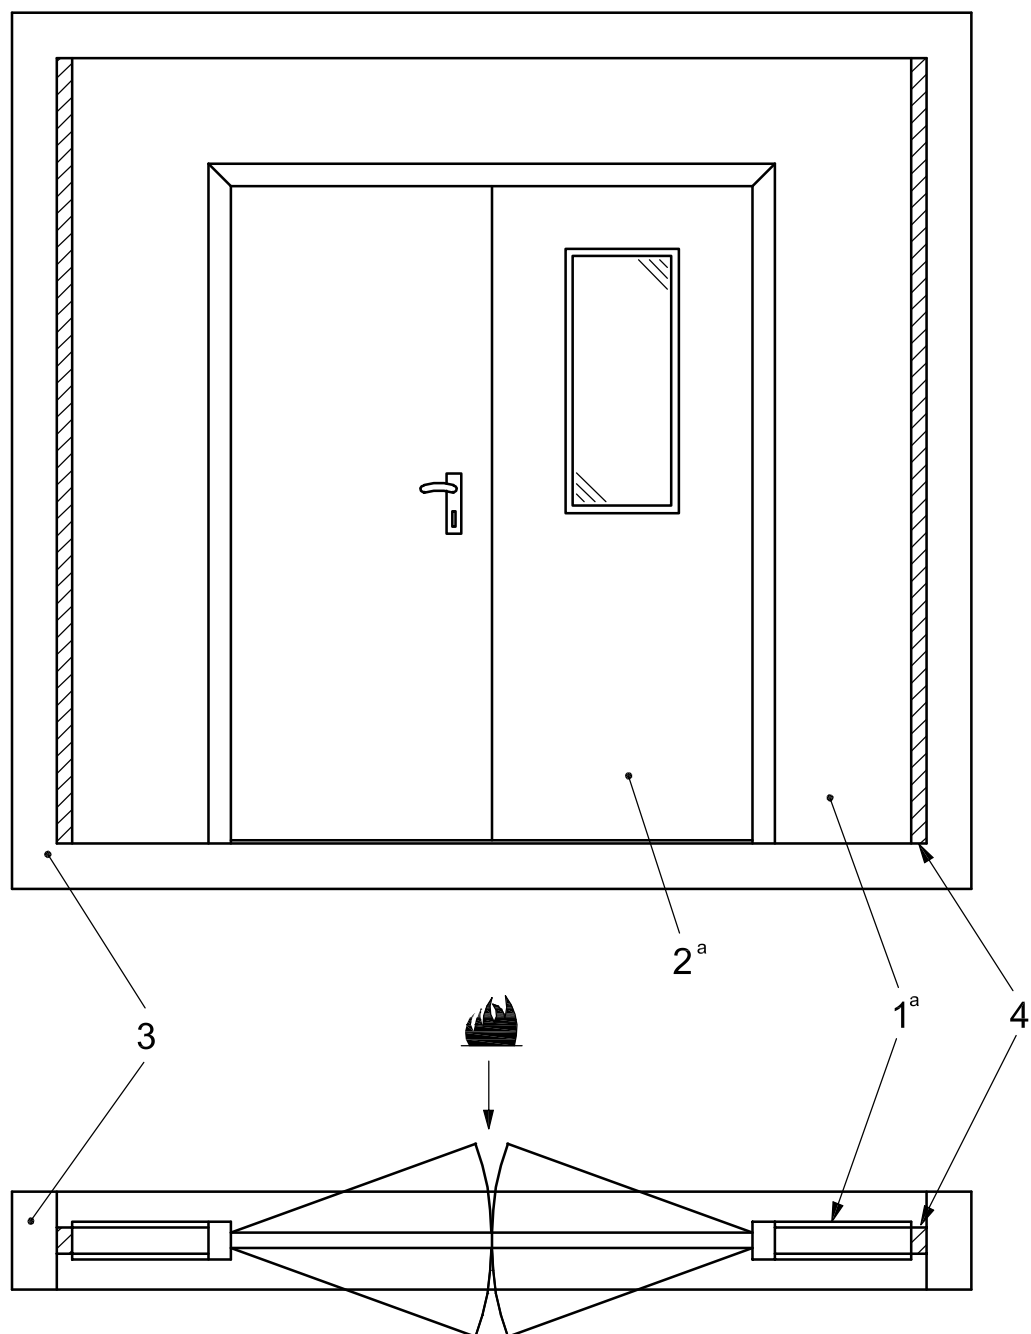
Example of a horizontal cross-section of a flexible standard supporting construction
